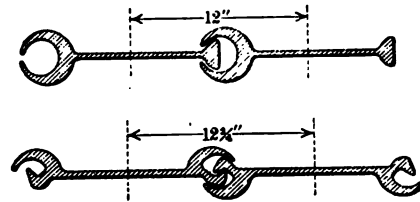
LACKAWANNA STEEL SHEET-PILING.
